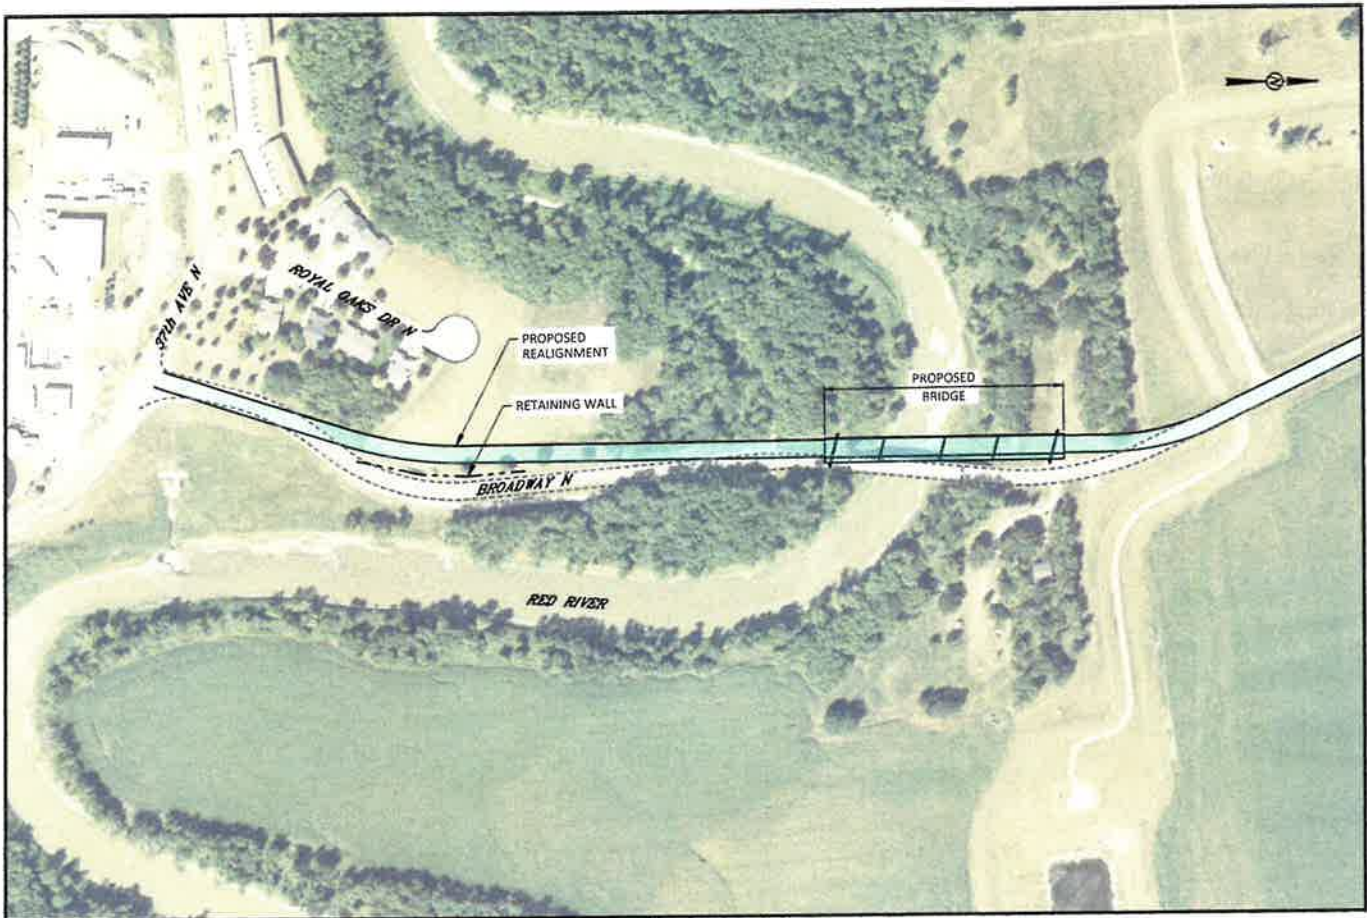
Option 1 Proposed Roadway Realignment and Bridge
